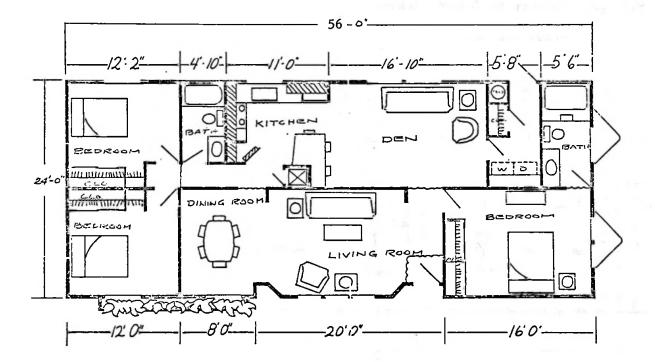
T-2A AND T-2B FLOOR PLANS (24 x 56)
